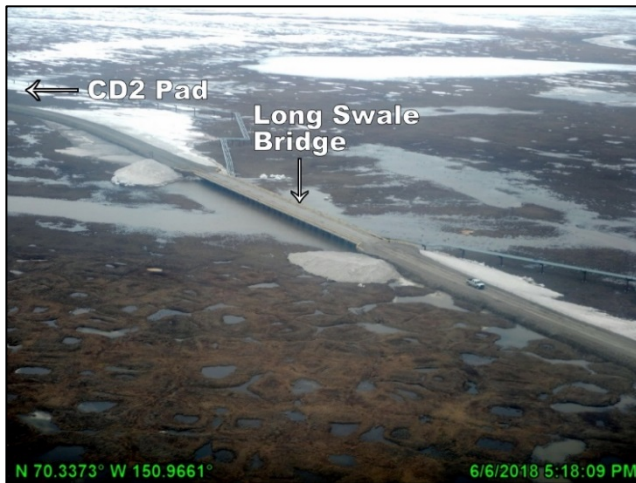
South side of CD2 road, looking northwest; June 6, 2018
